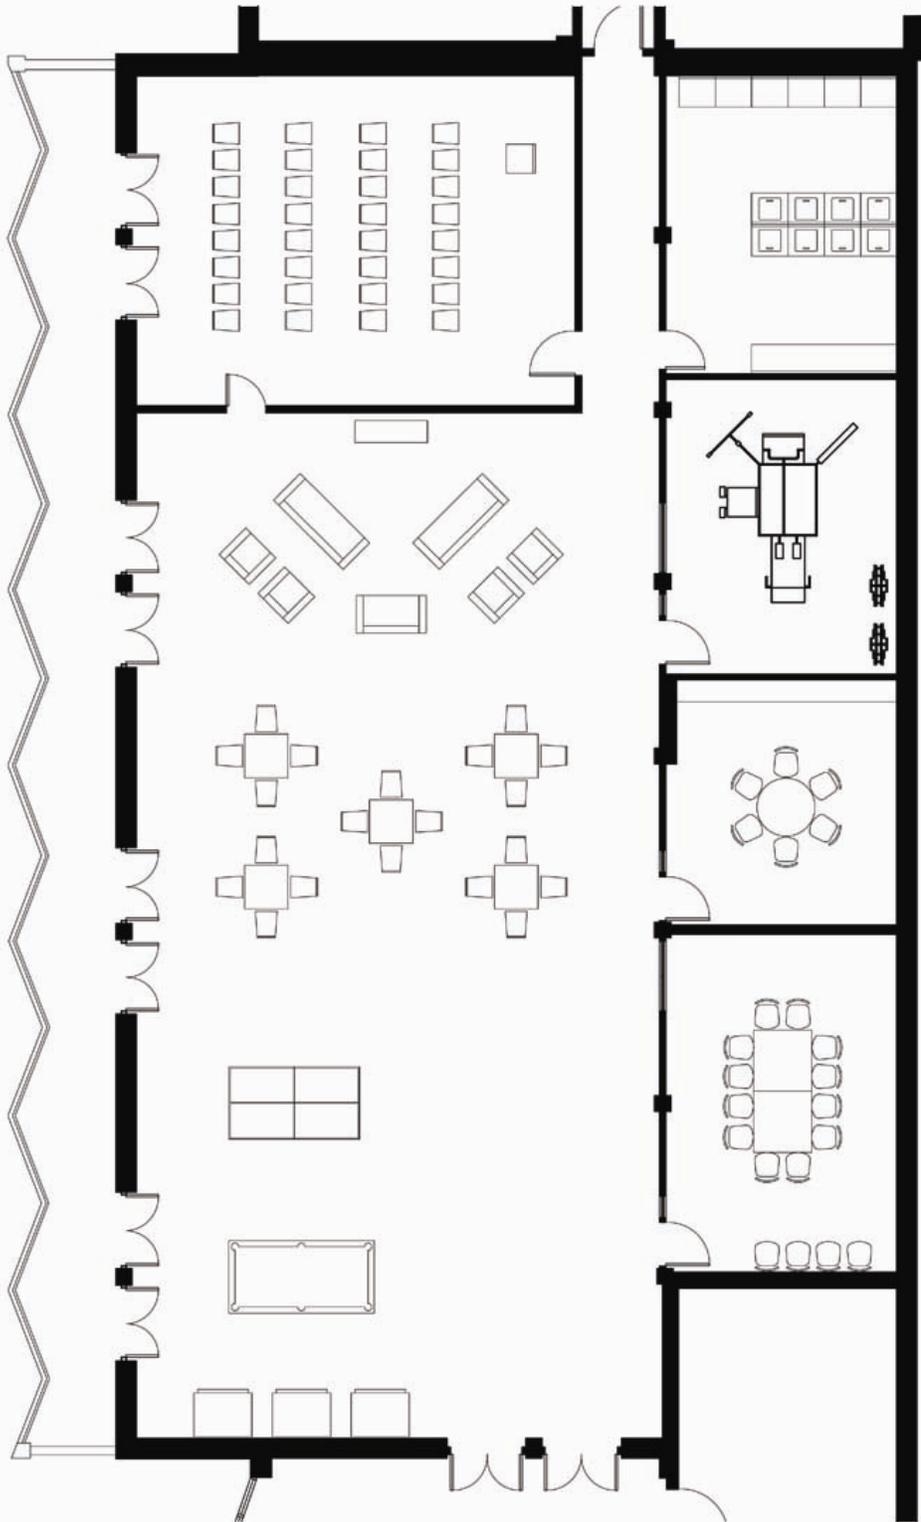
New Layout of Meeting Rooms, Fitness Room, Laundry Facility, and Recreation Room
